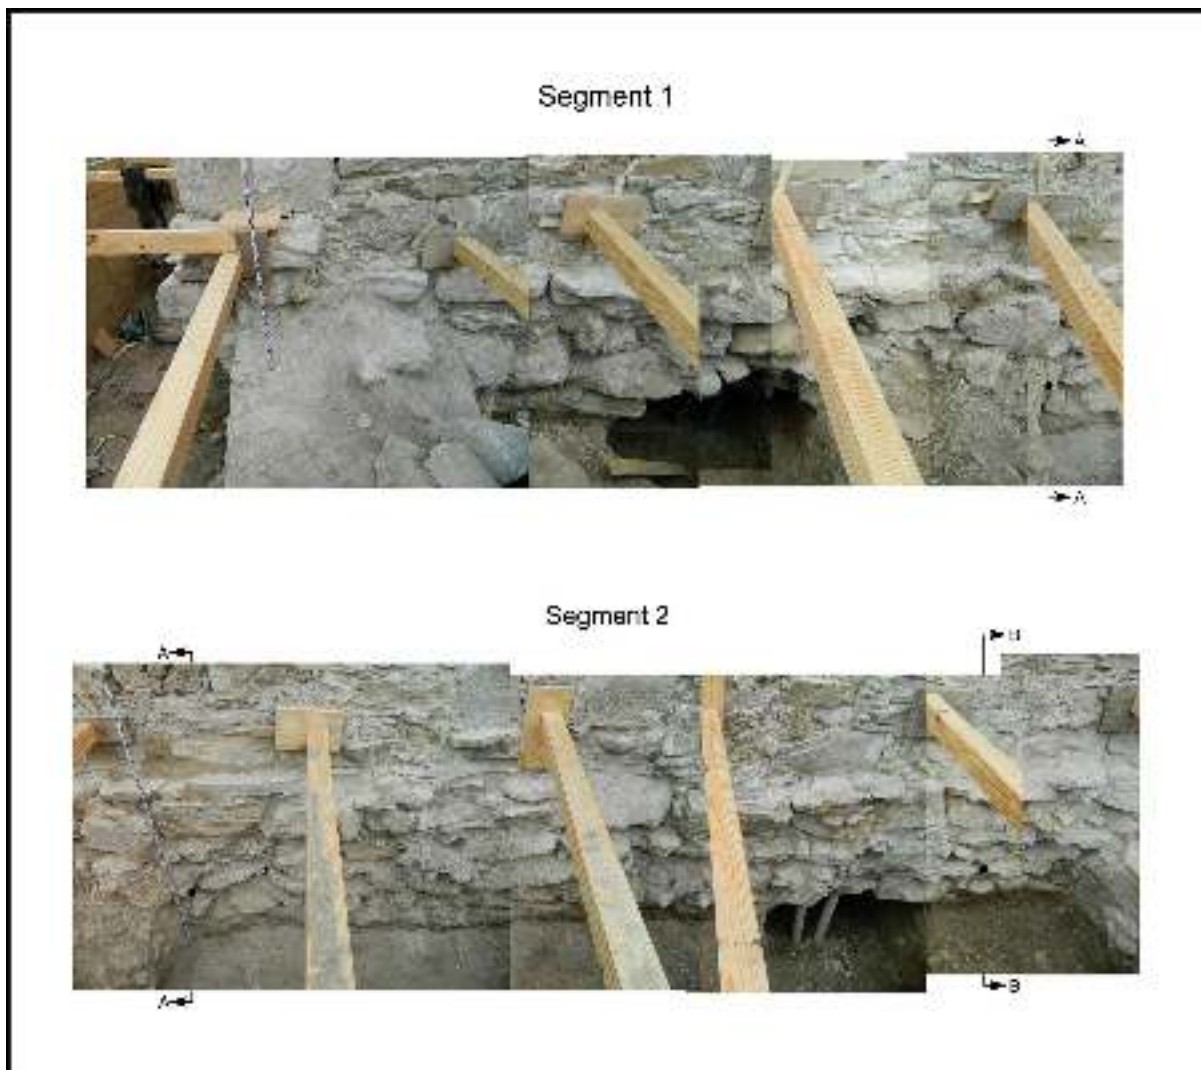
Segments 1 and 2 of the foundation of the west wall of the church.
